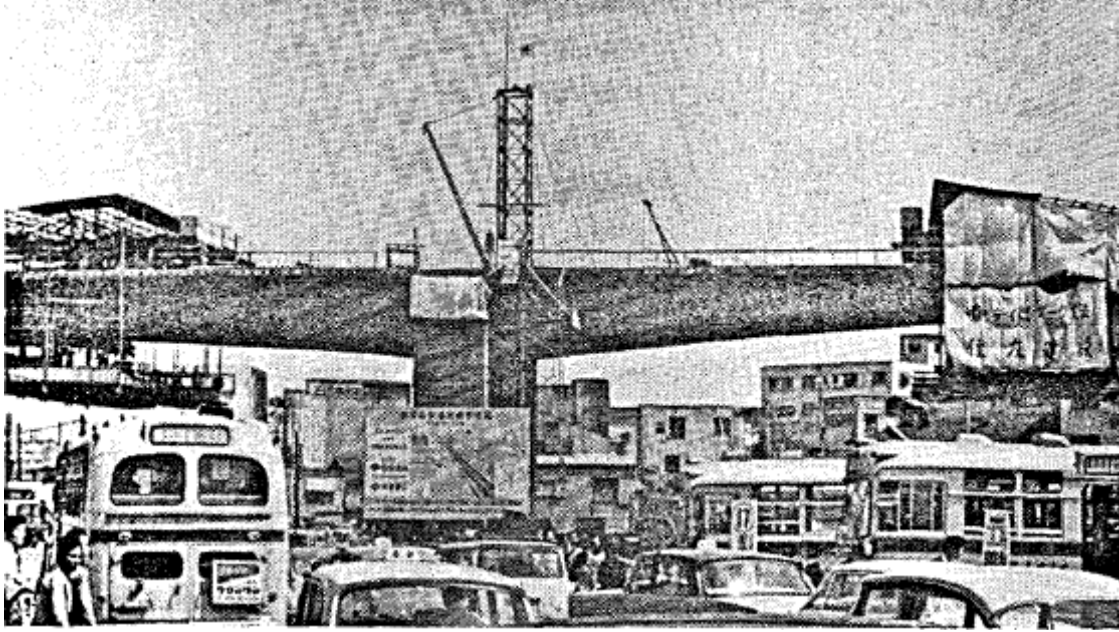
Double Cantilever Method: Shibuya elevated highway (Tokyo)
